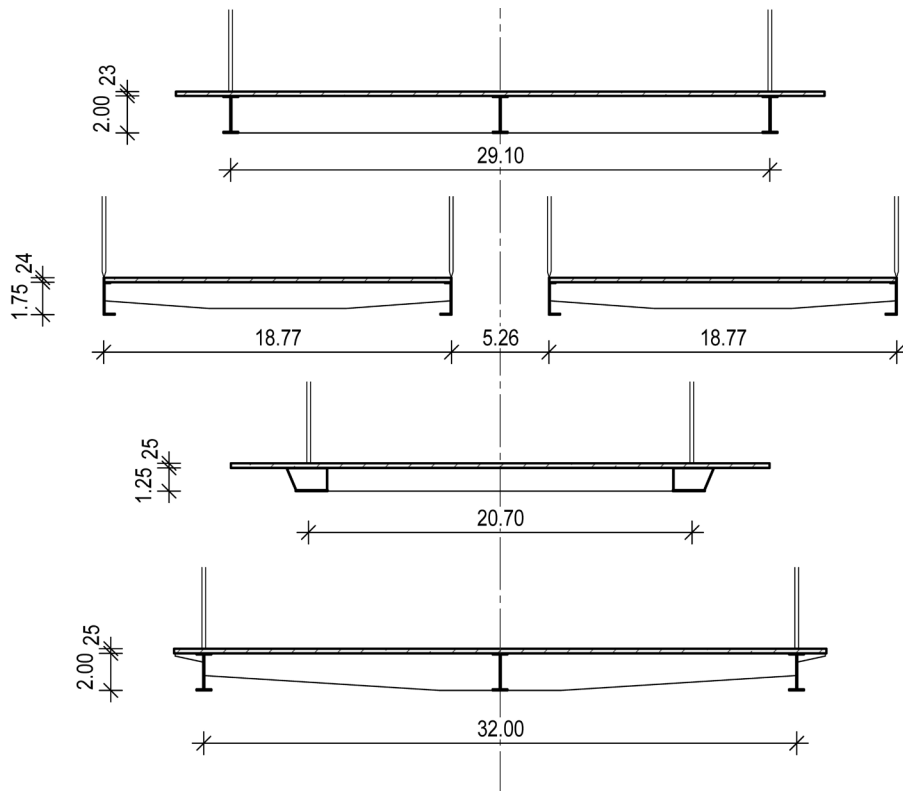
Schematic cross sections of composite decks in the same scale from top to bottom: Second Hooghly Bridge, Ting Kau Bridge, K03 over Albert Canal, Signature Bridge in New Delhi. ©schlaich bergemann partner
